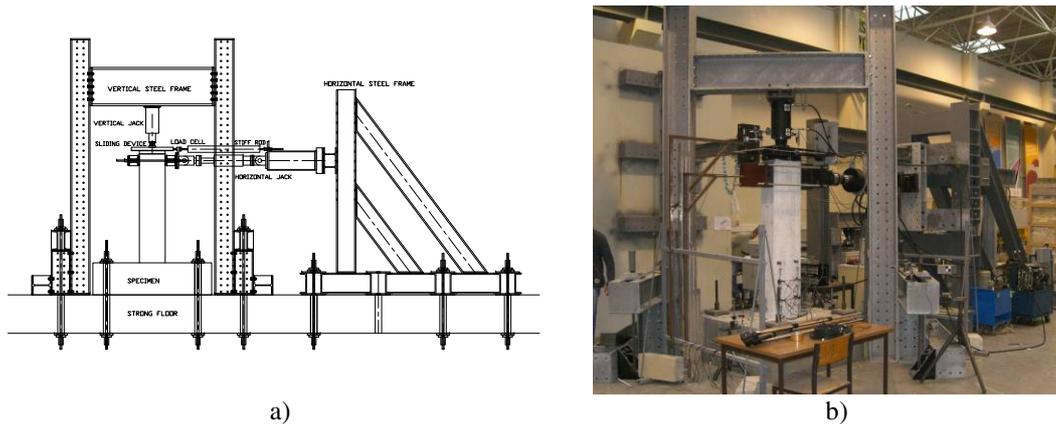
Testing setup at LESE laboratory: a) schematic layout; b) general view
